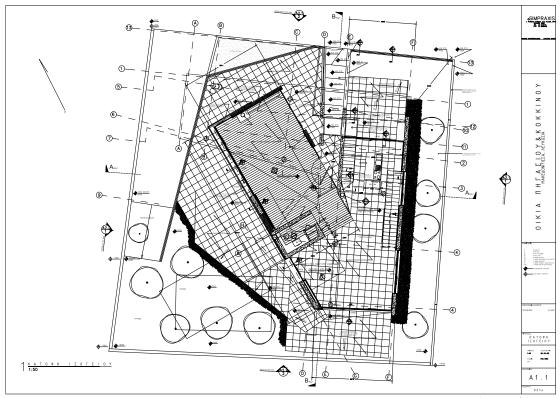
Residence Project Floor Plan designed by Sypraxis Architects (Bozatlı) The coding technique for determining the dimensions of door and windows applied
